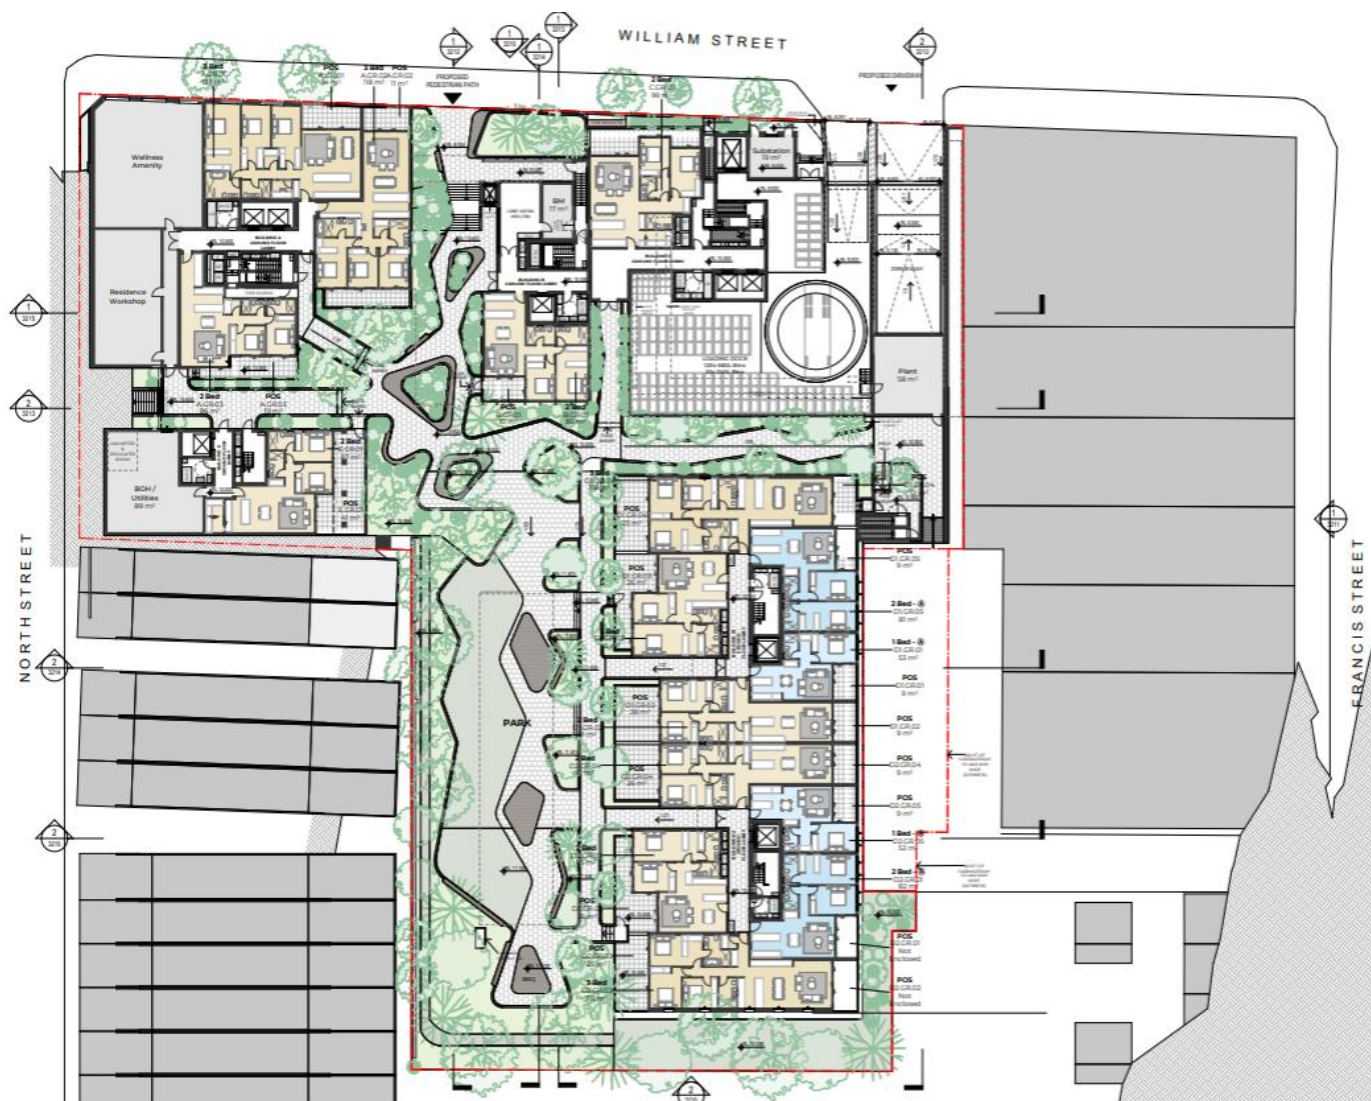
Proposed Ground Floor Plan (Source - Woods Bagot)
